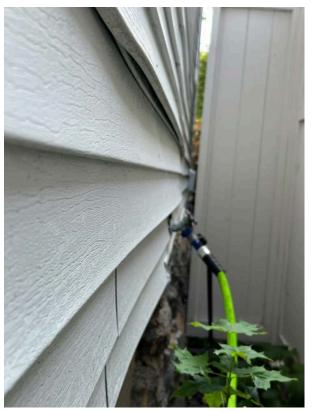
SEPARATED VINYL SIDING ALLOWING WATER INFILTRATION LEFT ELEVATION
